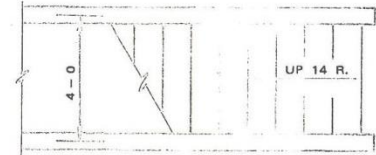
Information about a set of stairs which is usually included on the floor plan.
